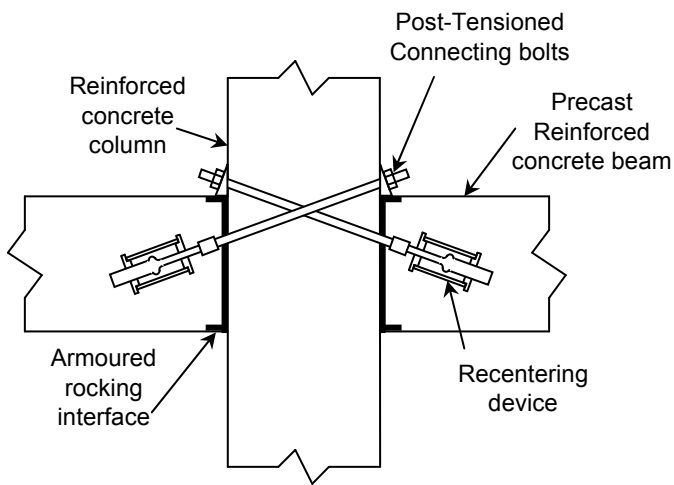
Schematic representation of recentering device placement into reinforced concrete connection using the Damage Avoidance Design details.
